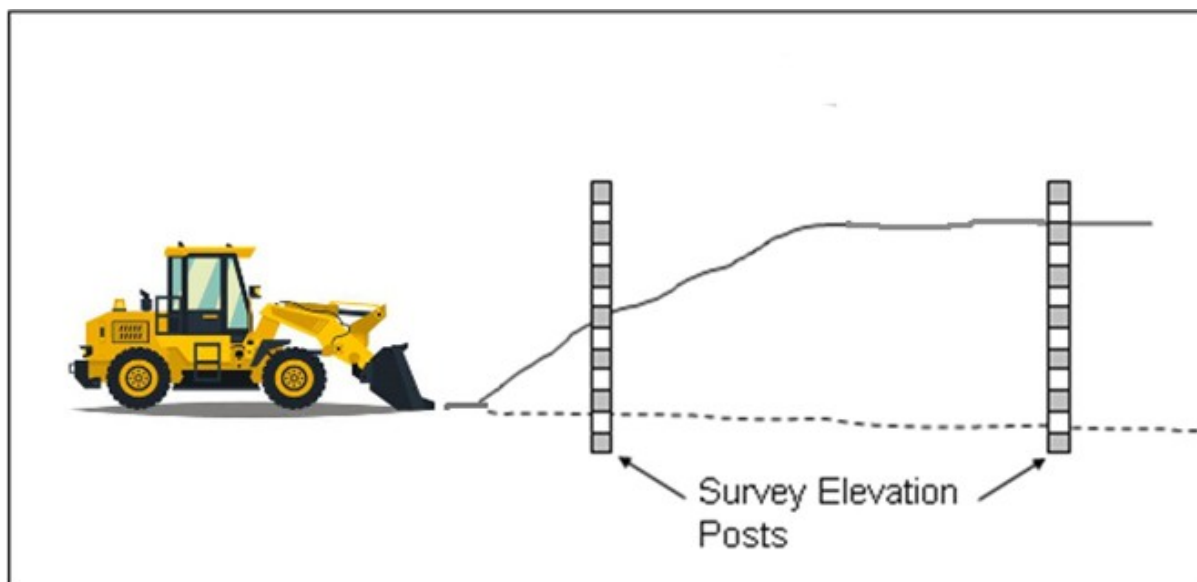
Schematic cross section of ilmenite stockpile showing GER proposed excavation and load arrangement with survey elevation posts used to control dig depth to natural ground surface.
